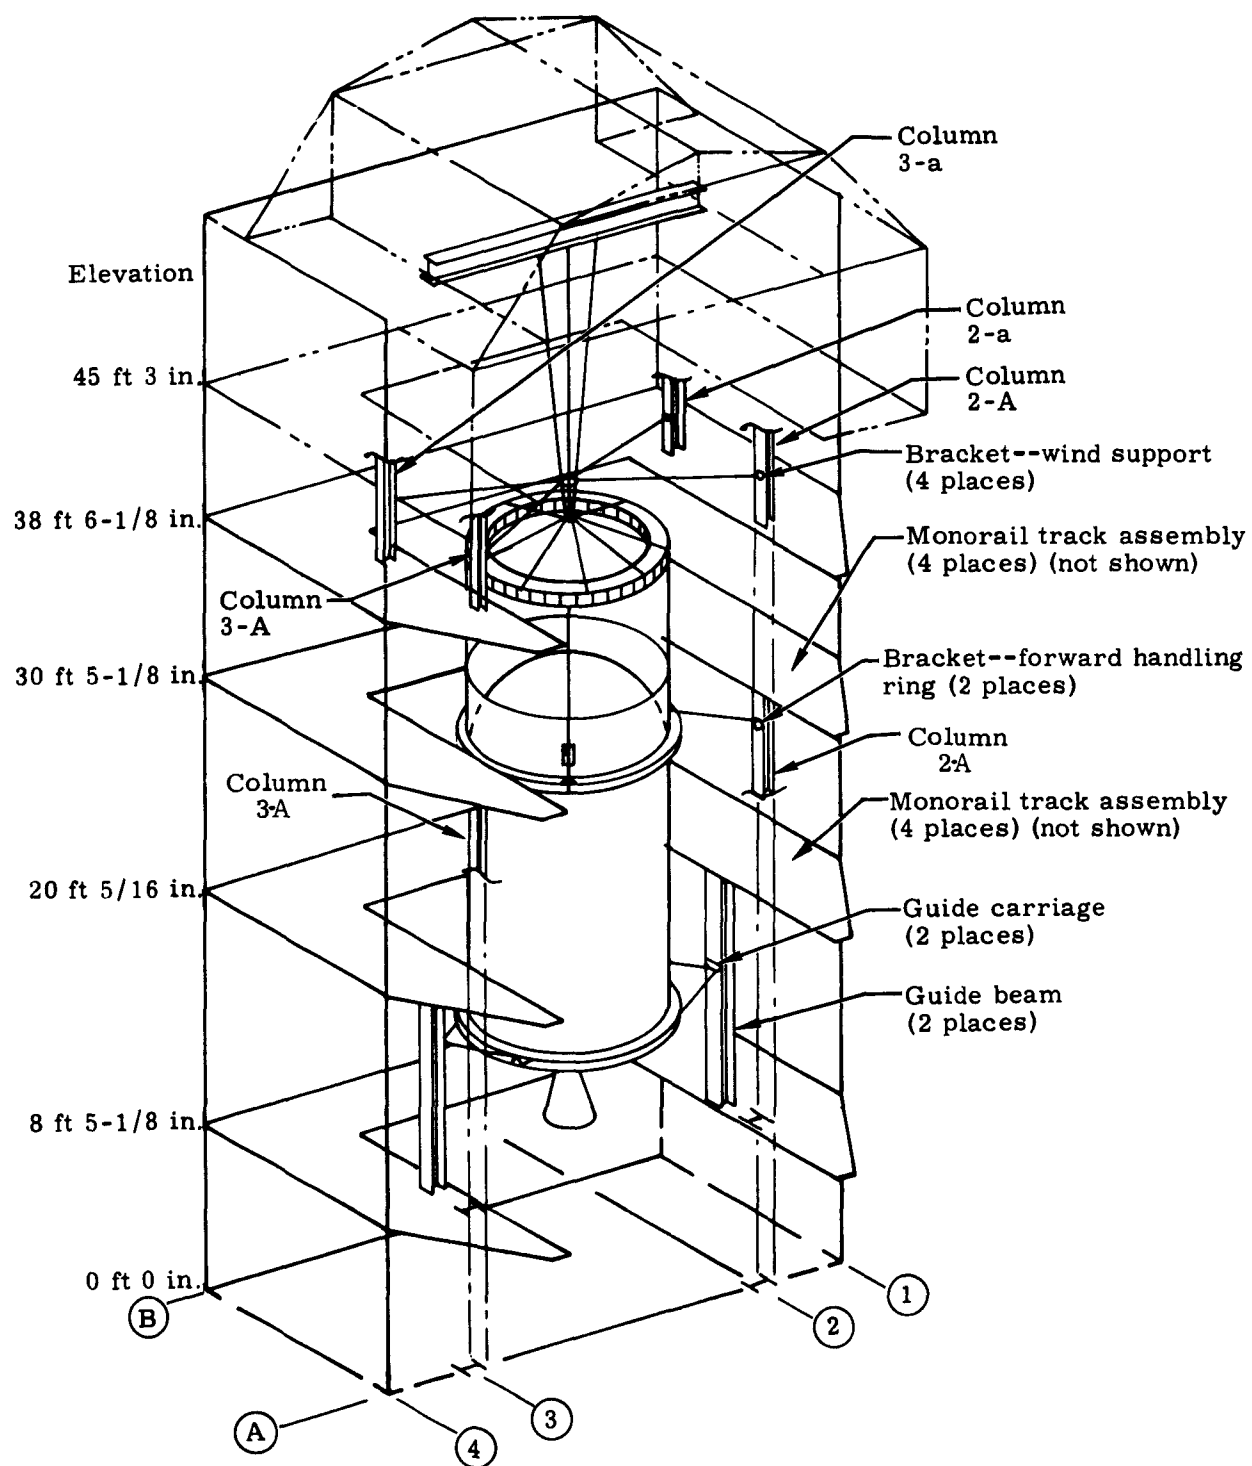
Stabilizing Line System Installation--Stage II Erector
